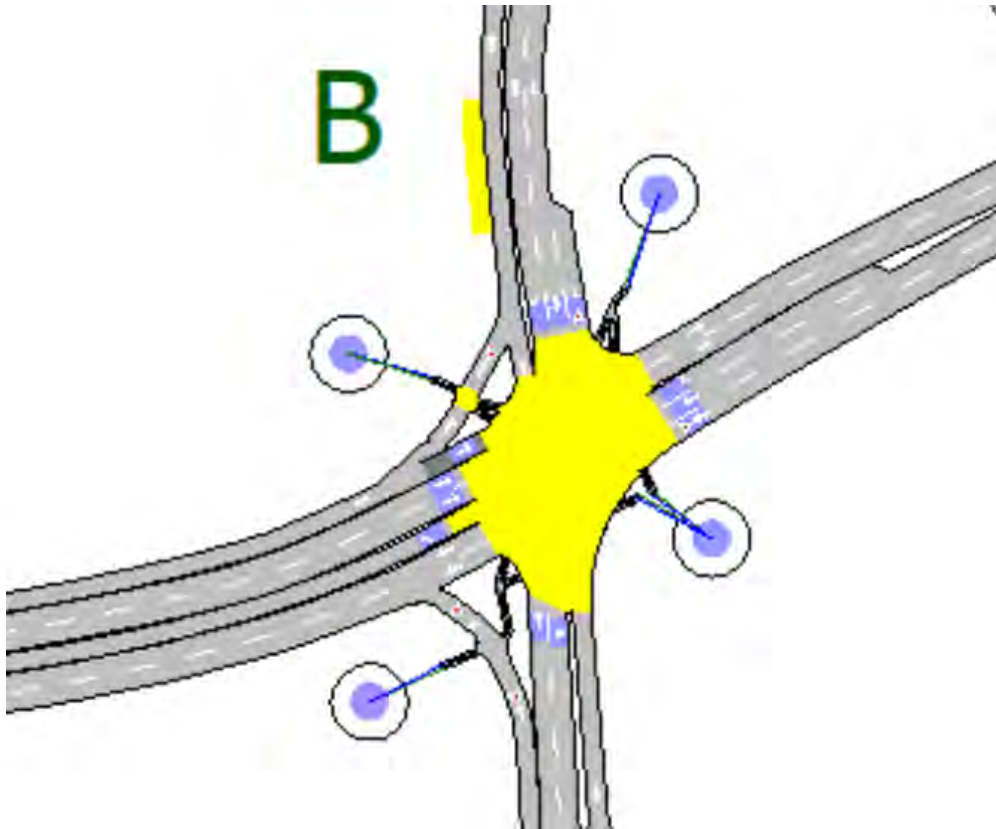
Proposed Great North Road / Pt Chevalier Road / Carrington Road Intersection Layout – Extracted from Aimsun model.
